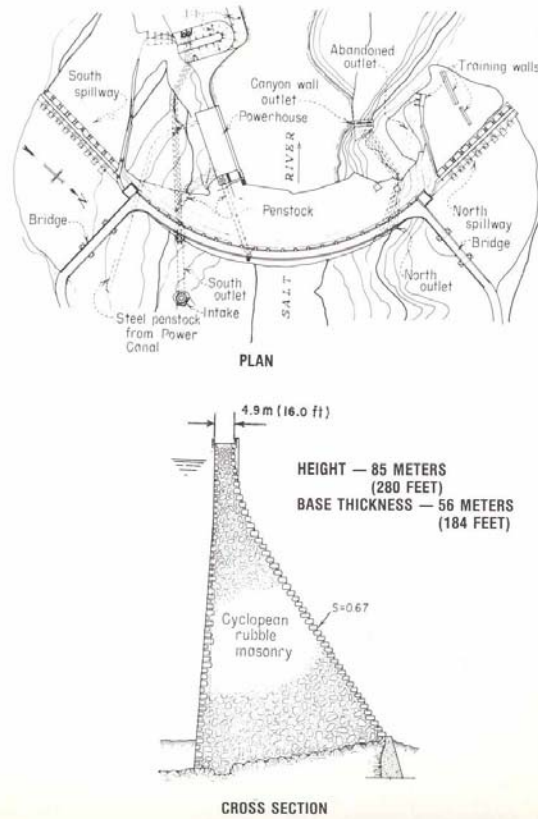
Theodore Roosevelt Dam, plan and cross section, P-801-D-79318.
